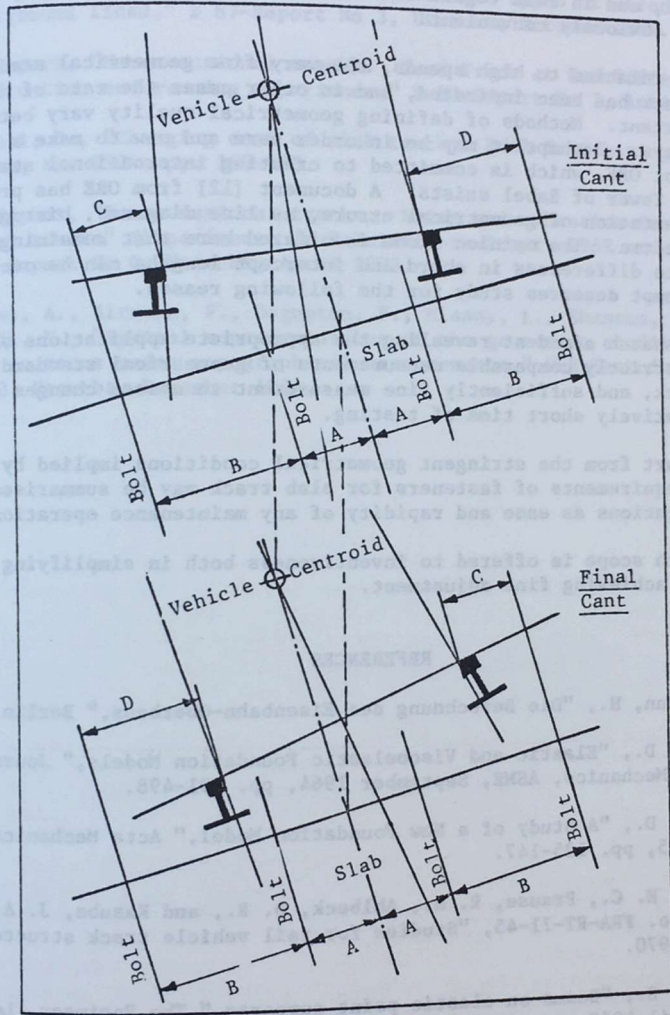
Changing Cant on Slab by Transposing Fasteners
